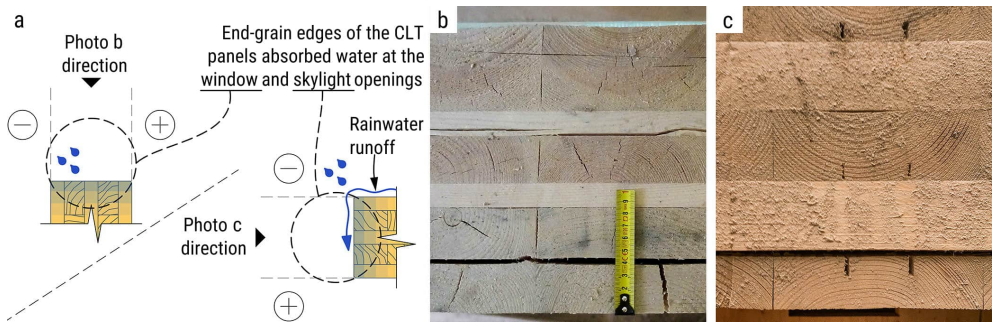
Wall to window (b) and roof to skylight (c) connections (a), which experienced repeated wetting and where cracks and delamination occurred (b, c) after moisture dry-out (b = building A, c = building B).
